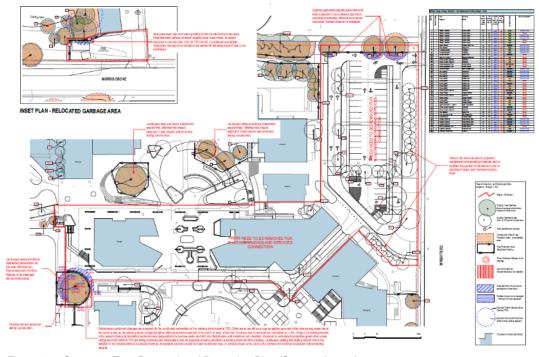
Stage 1 – Tree Removal and Protection Plan (Source: Arterra)
